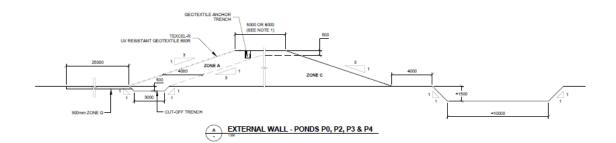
Proposed excavation trench (from Knight Piesold 2018)
